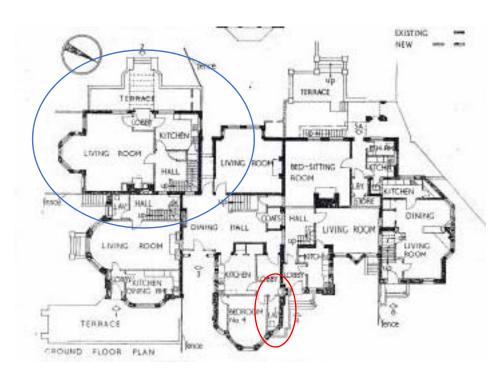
1952 Ground Floor Plan showing the 1951/1952 conversion to separate houses, indicating previous basement accesses and an additional extended lightwell between numbers 17 and 18. The 1920s conservatory extension to number 20 had become a terrace.
